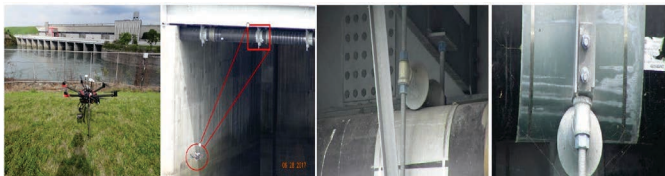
sUAS techniques perform pipeline inspection inaccessible to traditional technique
